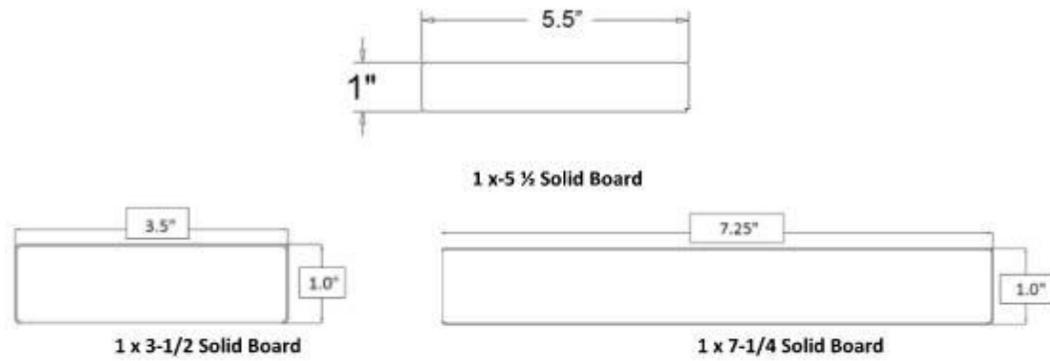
AZEK HARVEST* COLLECTION*, ARBOR COLLECTION*, AND VINTAGE COLLECTION
